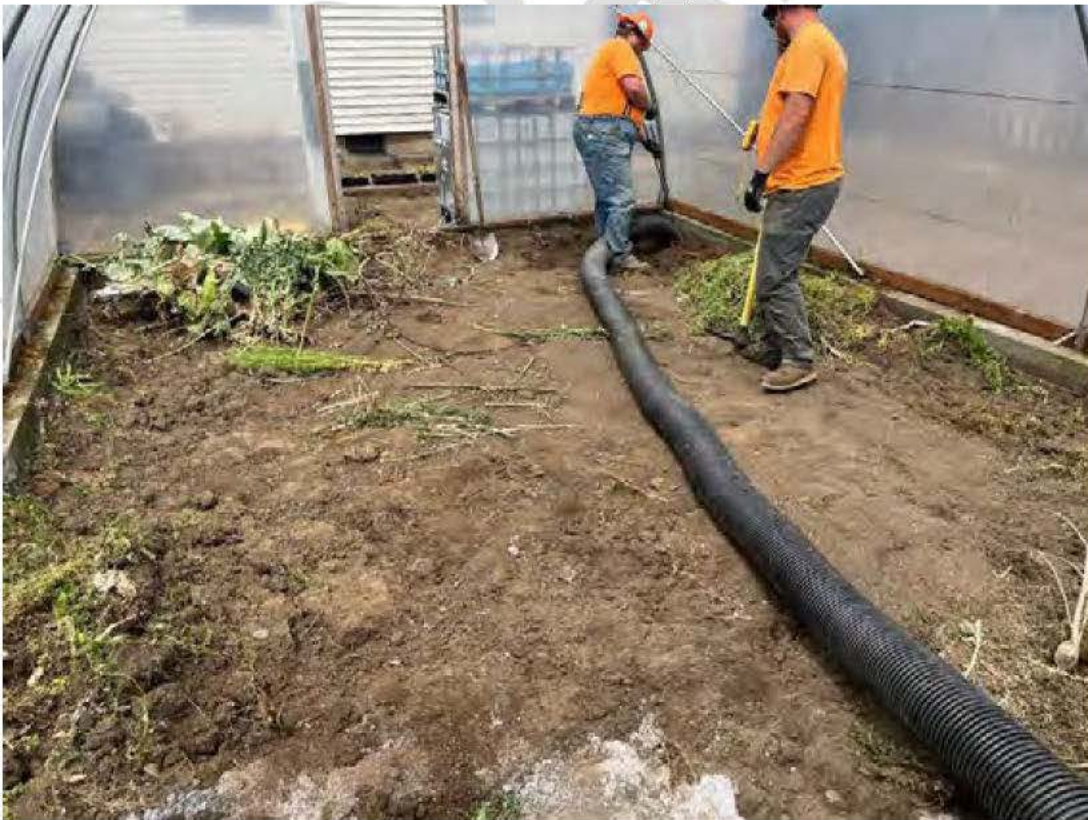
Surveyor grade checking at [REDACTED] Baxter. Photo taken facign east.
